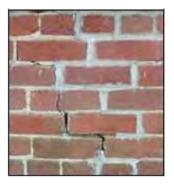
The spot repointing of this wall does not match the original in color, texture, or form of joints. The dark gray color and texture of the mortar indicates that Portland cement mortar was used. The cracked and spalled brick (center top) resulted from the expansion of the harder Portland mortar.
